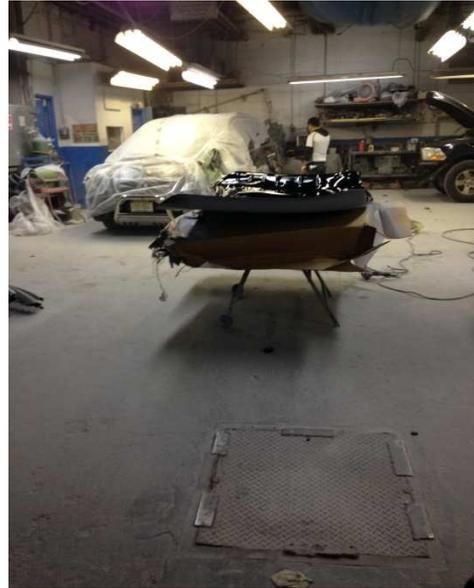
square-shaped floor drain in the middle of the main floor of the auto-body/collision
